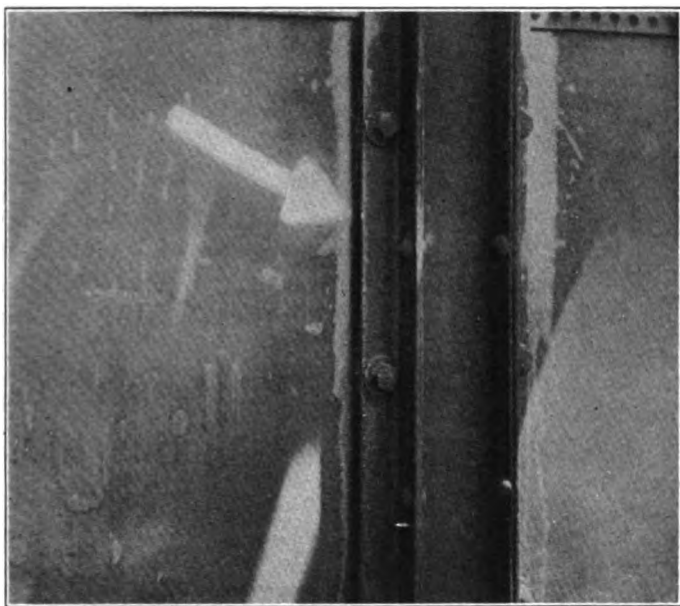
Space between vertical leg and section sheet. Page 794.
